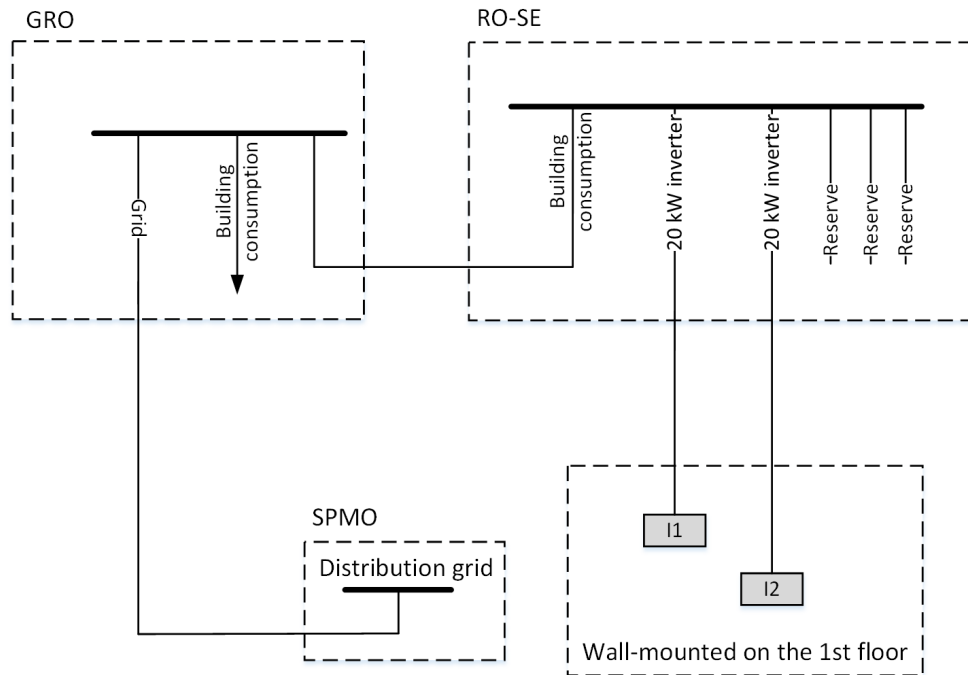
Block schematic of FERIT building power system in Cara Hadrijana street
